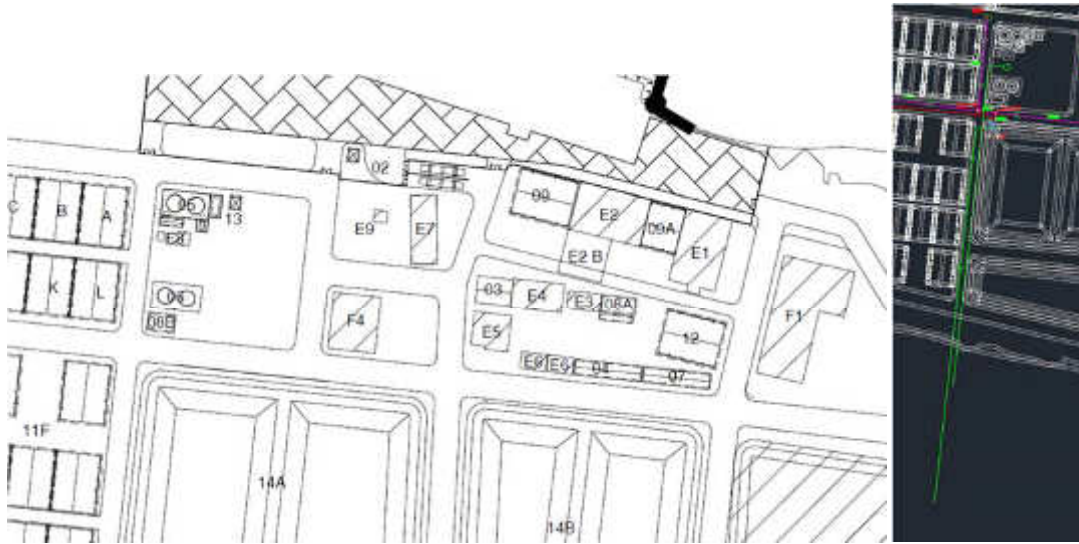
Location of utility building and brine out fall. Existing utility building is marked as E3. New borehole will be established adjacent to the proposed desalination building (image on right). Water storage tanks are to be established at building no. 06 and fuel and waste oil storage tanks at building no. 05. Building no. 08A is the proposed powerhouse and 08B desalination building.
